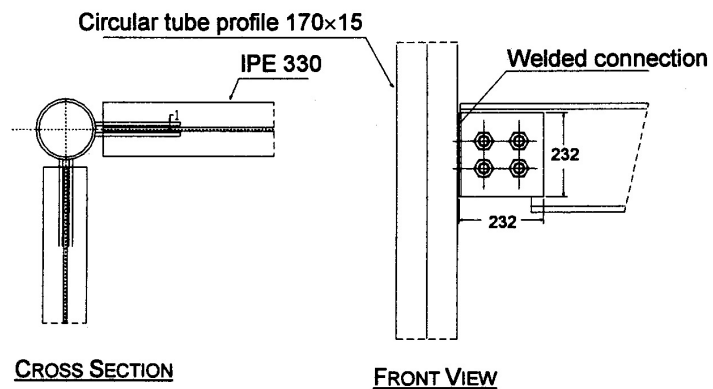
Typical Beam-to-Column Connection of the Original Structures
